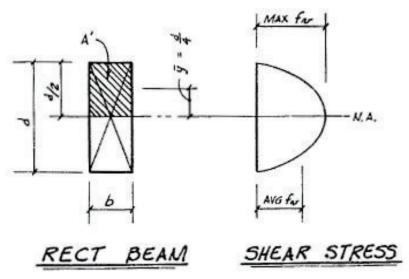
Shear stress distribution in a typical wood beam (rectangular section).
